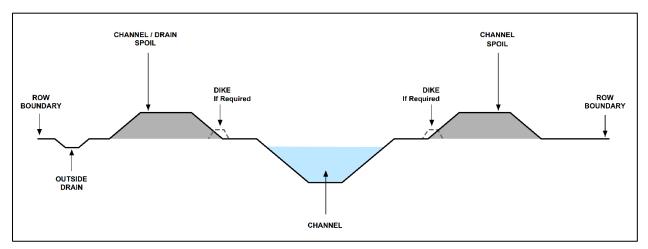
Typical Cross-Section of the Lake Manitoba Outlet Channel
